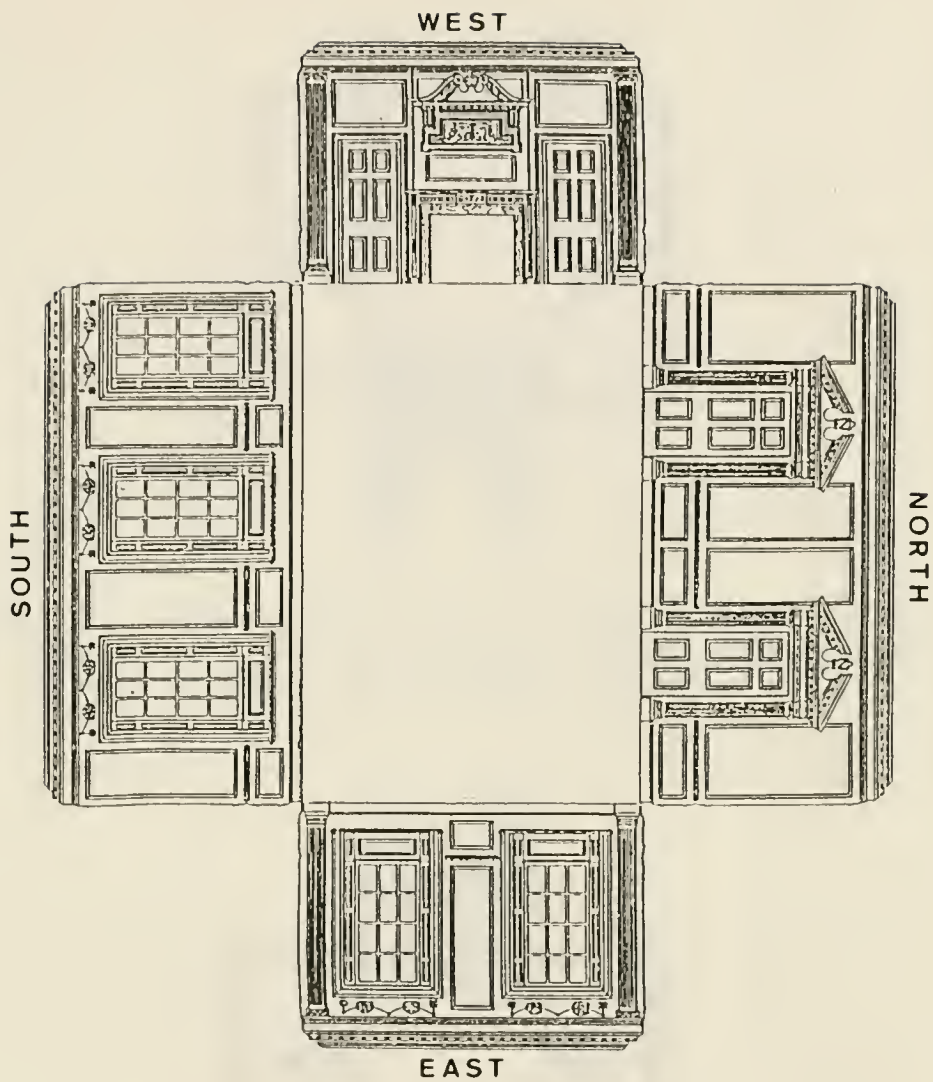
Wall elevations, Ionic drawing room, Drayton Hall (RGF after drawings by Seel in Stoney)
